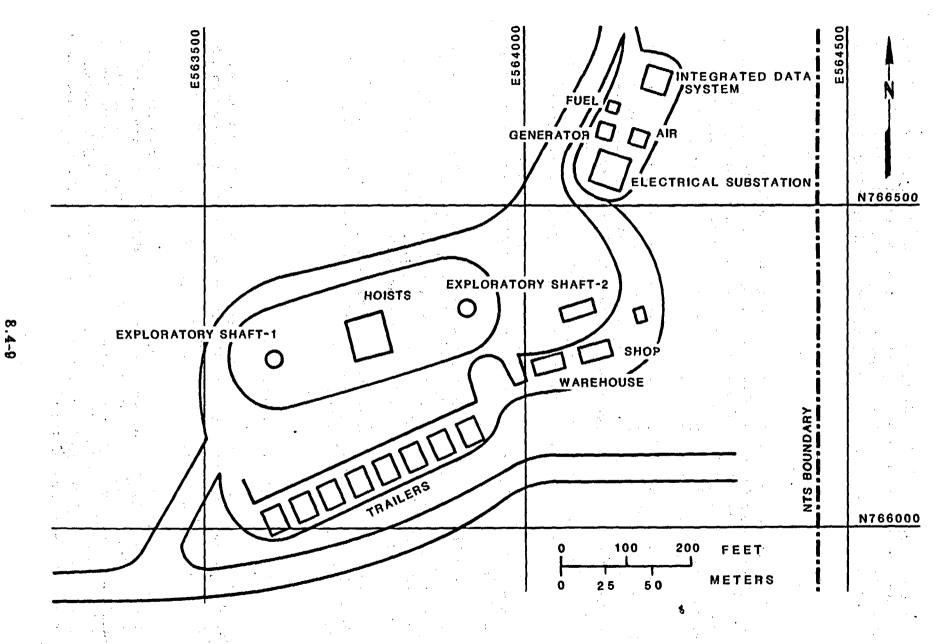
Conceptual surface layout of the exploratory shaft facility site.
